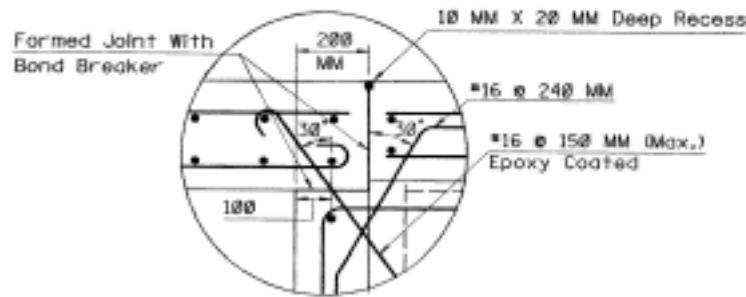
Approach slab detail to be used on the Scotch Road bridge.
